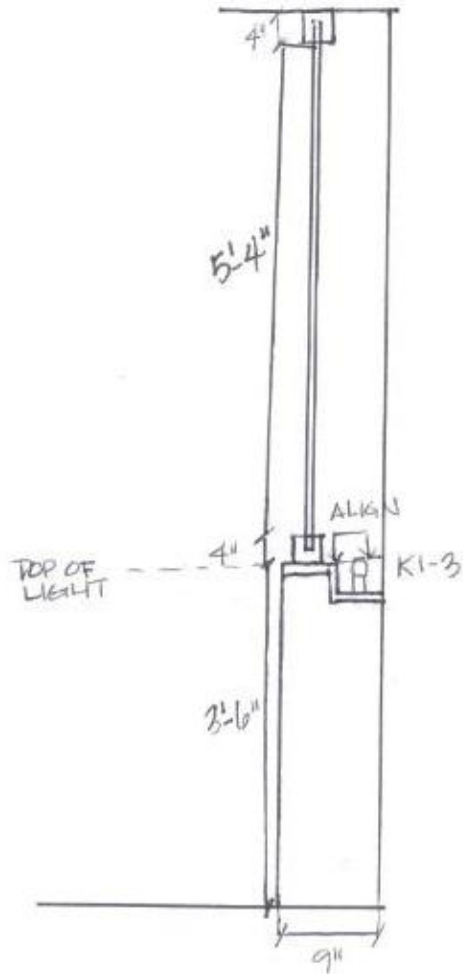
Entry Signage/ Receptionist Back Wall Detail in Lobby | NTS
